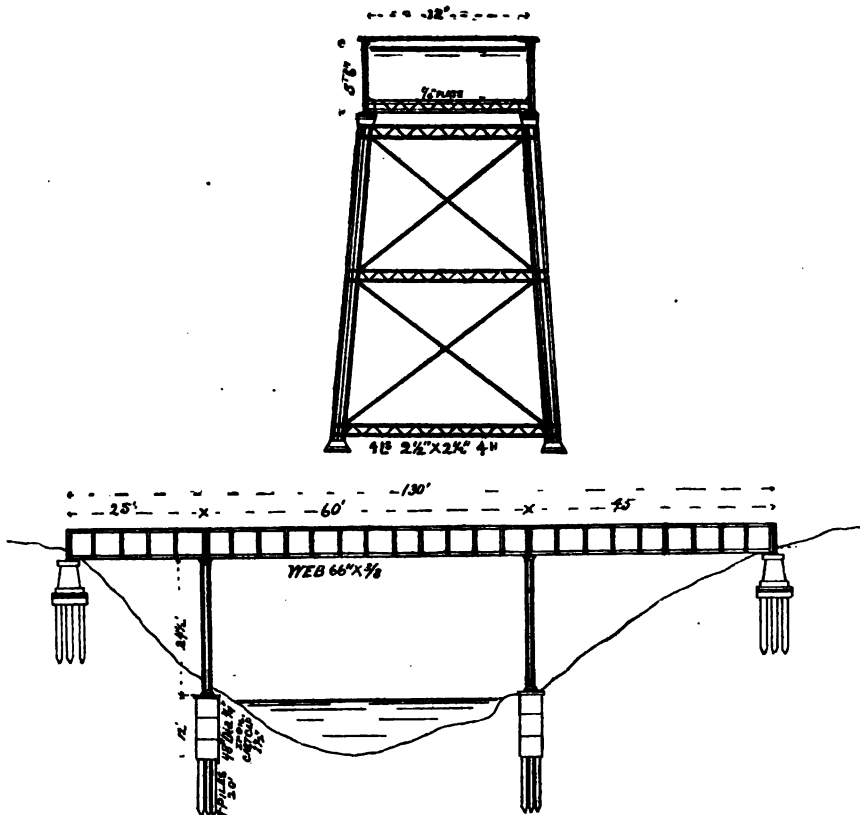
Bear river canal. Elevation and cross section of iron flume on Corinne branch.
